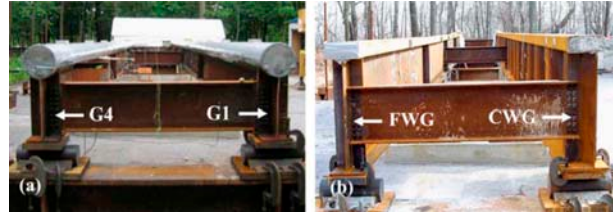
Tubular flange girders with flat webs or corrugated webs, Sause *et al.* (2008).
